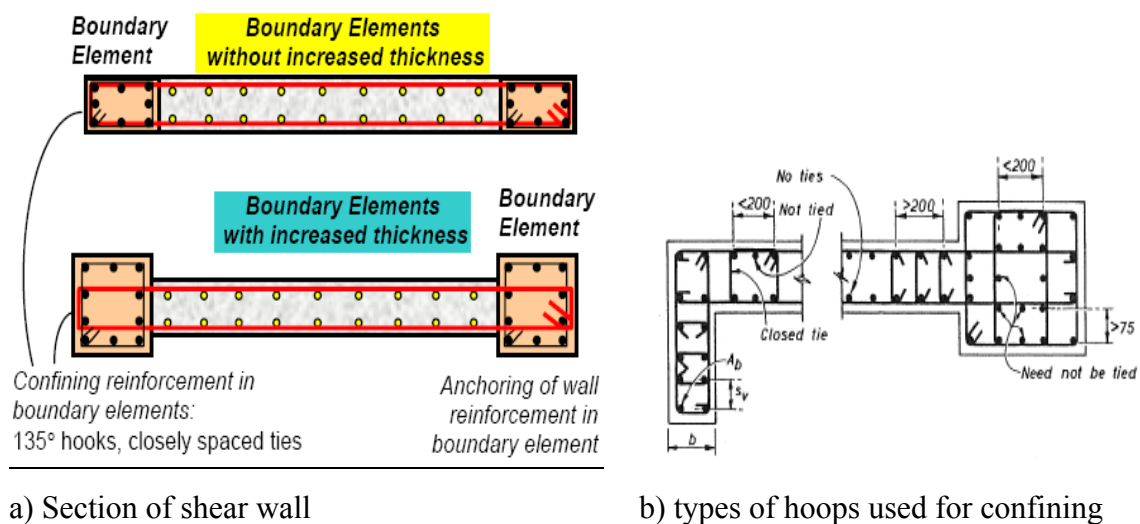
Provision of confining reinforcement of shear wall shown in (a) section with (b) different types of hoops used for confining shear wall
